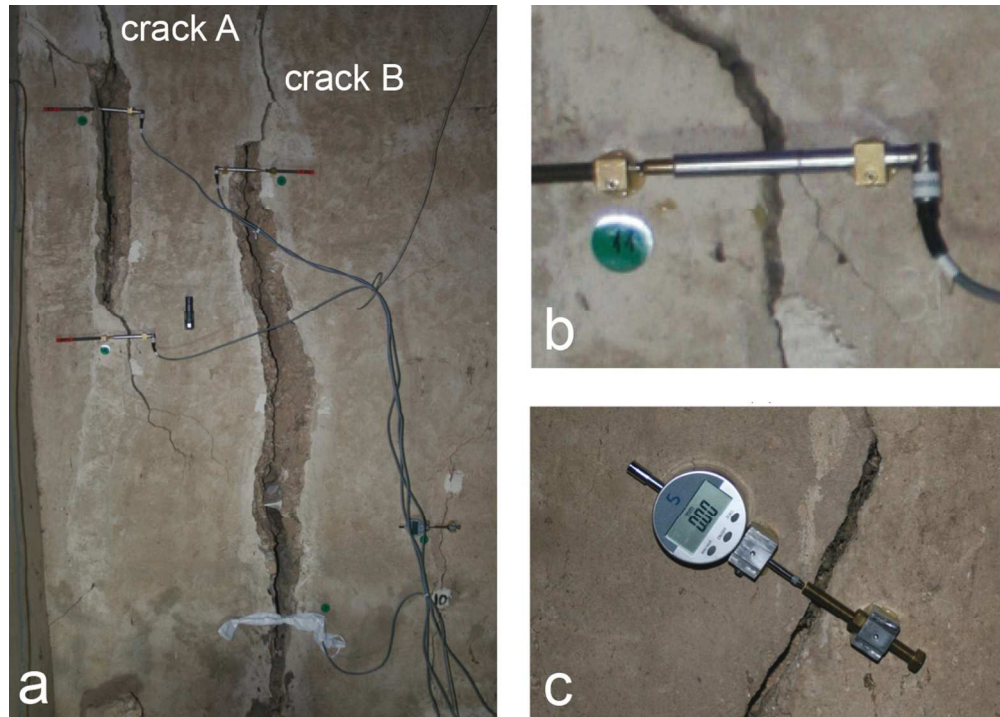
LVDTs used in short-term monitoring (a,b); digital crack meters used medium-term monitoring (c).
